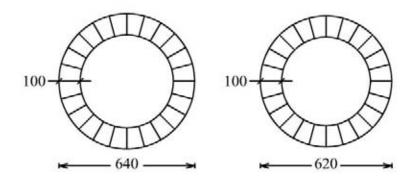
cross-section of columns and beams for wooden tube model, in mini meter
